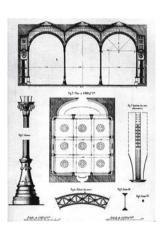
Drawing of reading room (right) Plan, section and details (above) Henri Labrouste, reading room of Bibliothèque Nationale, Paris (F), 1854–75
